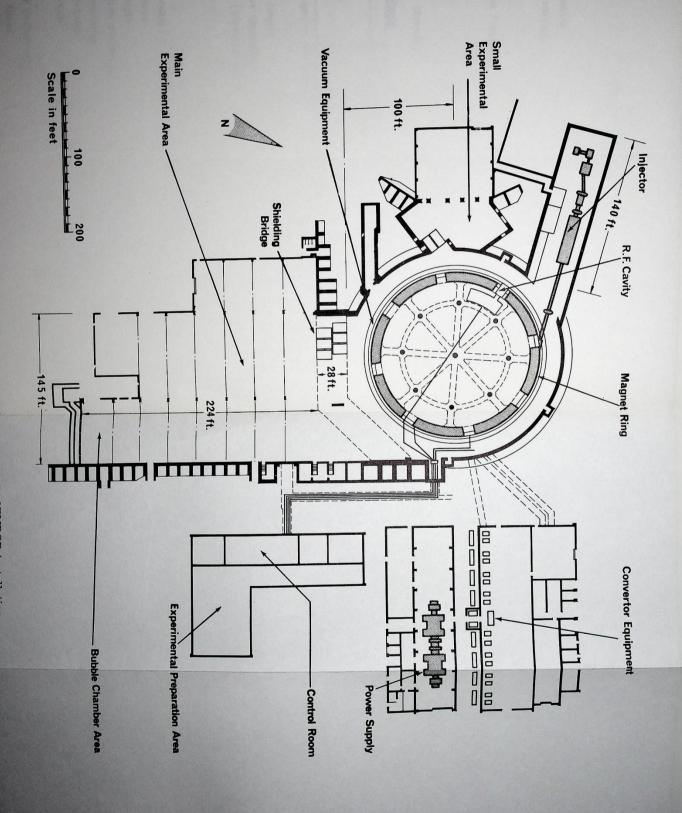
(i) A simplified plan showing the layout of the NIMROD installation.
